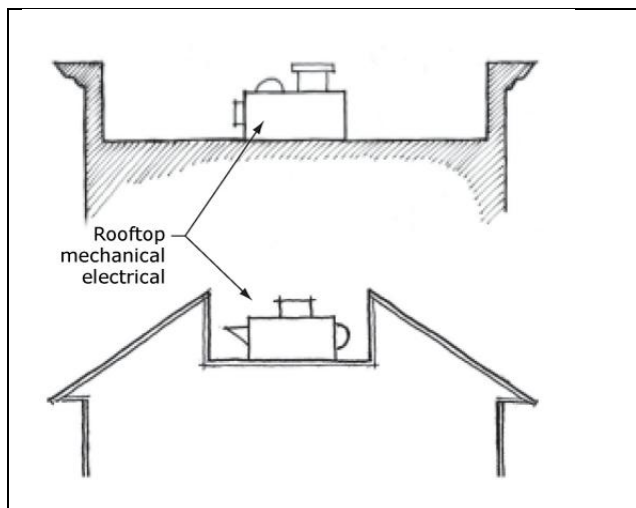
C.123.060-C: Rooftop and ground-level equipment must be screened from view along public rights-of-way. Here mechanical systems are hidden by cornice and roof elements.
